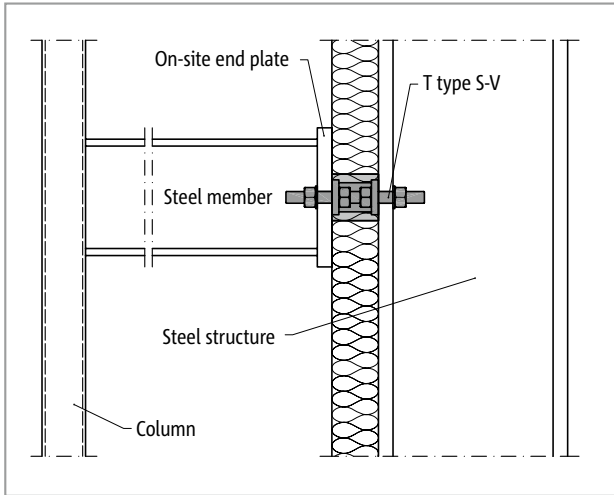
Schöck Isokorb® T type S-V for supported steel structures
